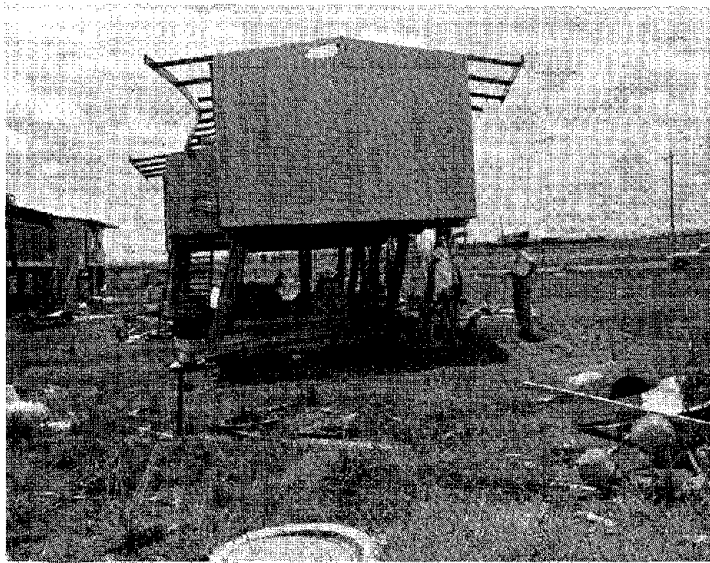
Failure of concrete block shear walls and racking of concrete piers
